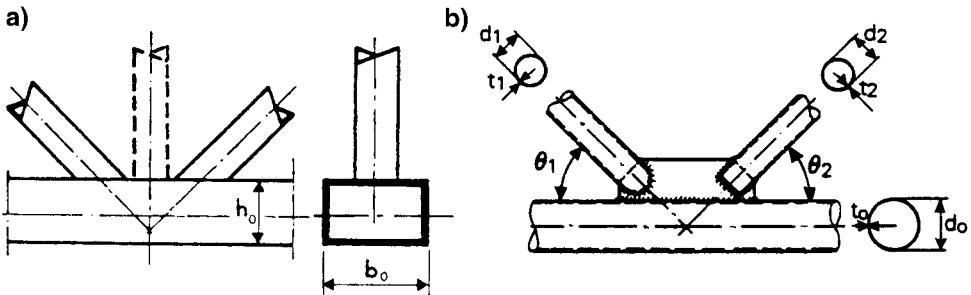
Welded hollow section connection a) members directly welded to one another b) members joined through gusset plates indirectly
